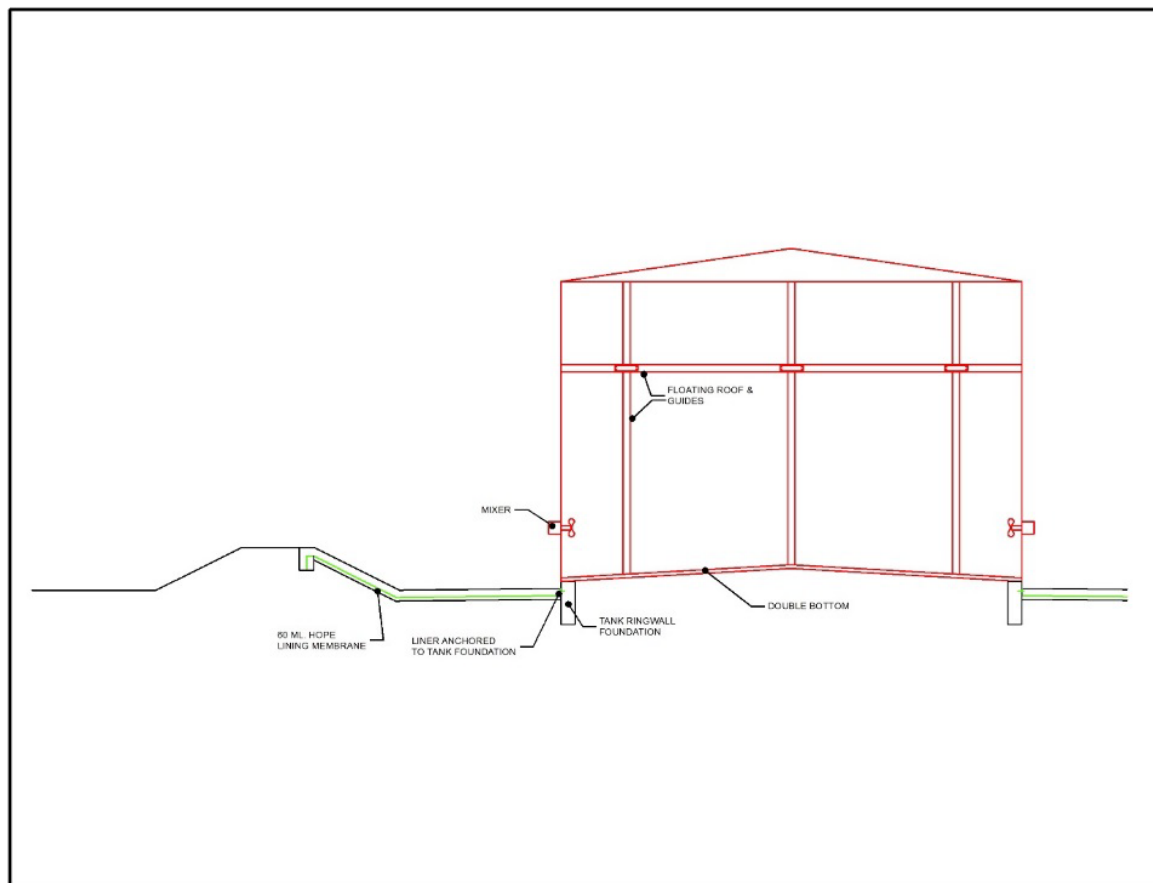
Cross-Section of Typical Storage Tank with Containment Berm
